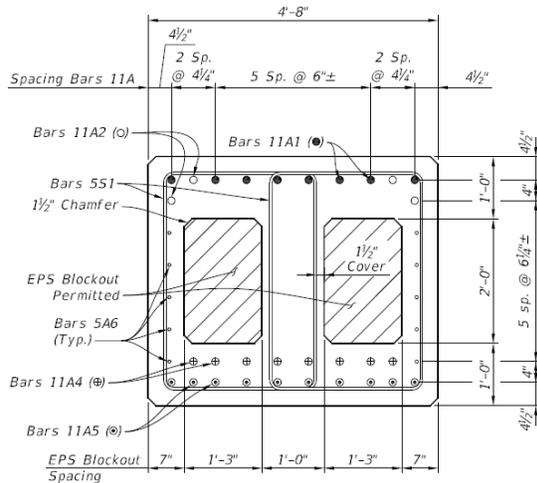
Precast intermediate bent cap voided section (US 90 pilot project)
